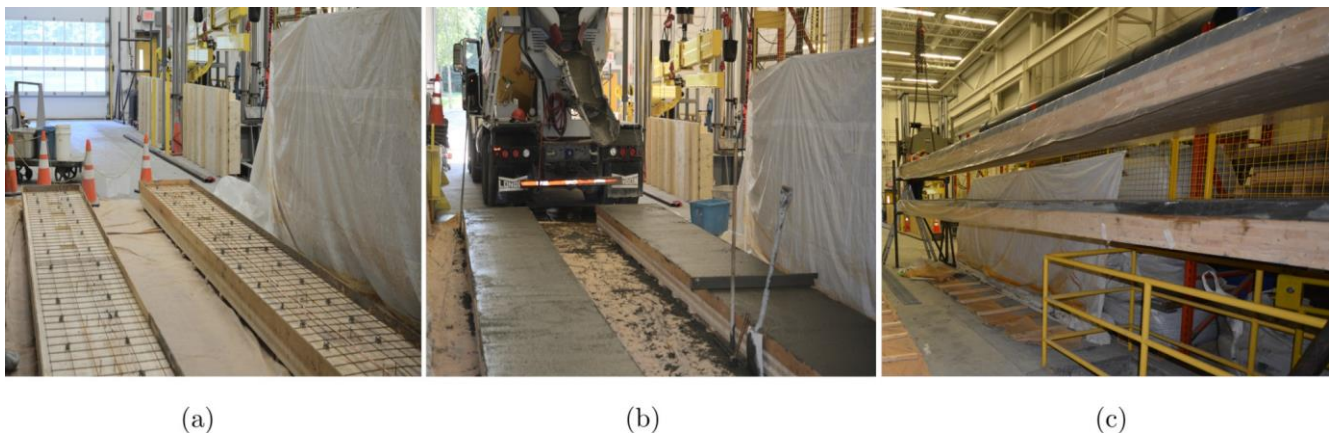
Fabrication procedure of the TCC slabs. (a) view of CLT-slabs before the concrete pouring, (b) TCC slabs after the concrete casting and (c) slabs placed being simply supported.
